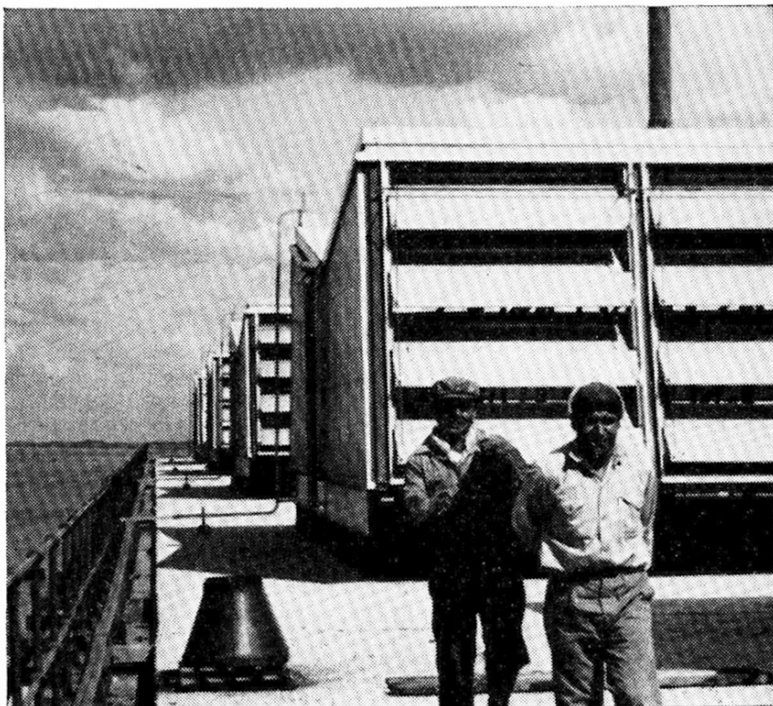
BOILERHOUSE ROOF VENTILATORS
